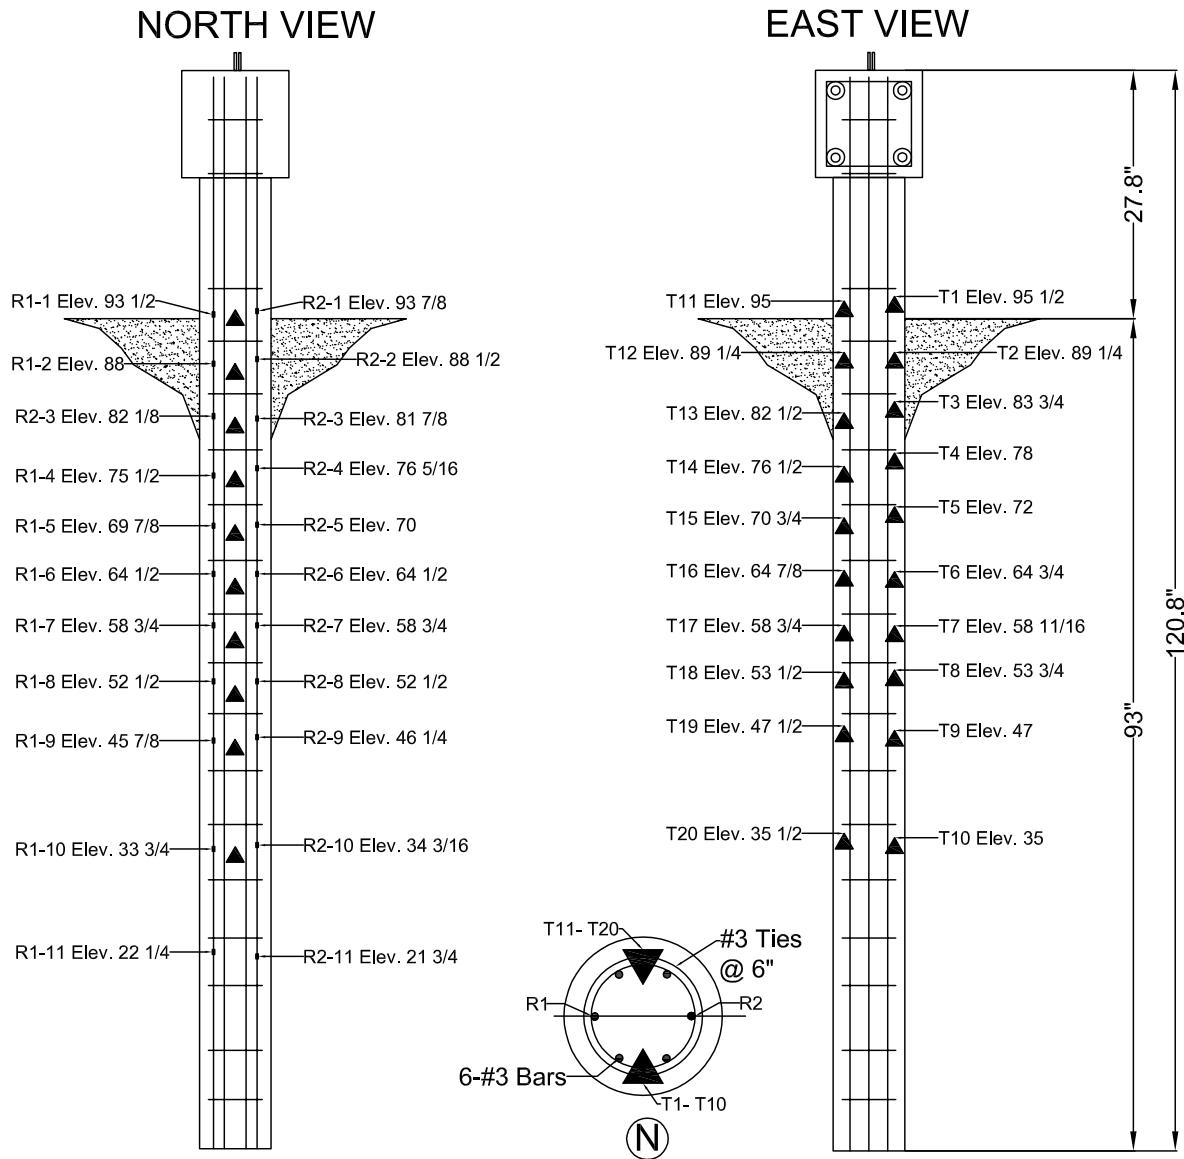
Pile 1. Schematic of the location of the strain gauges installed on two longitudinal rebars (North View), tetrahedra (East View), and pile cross section.
